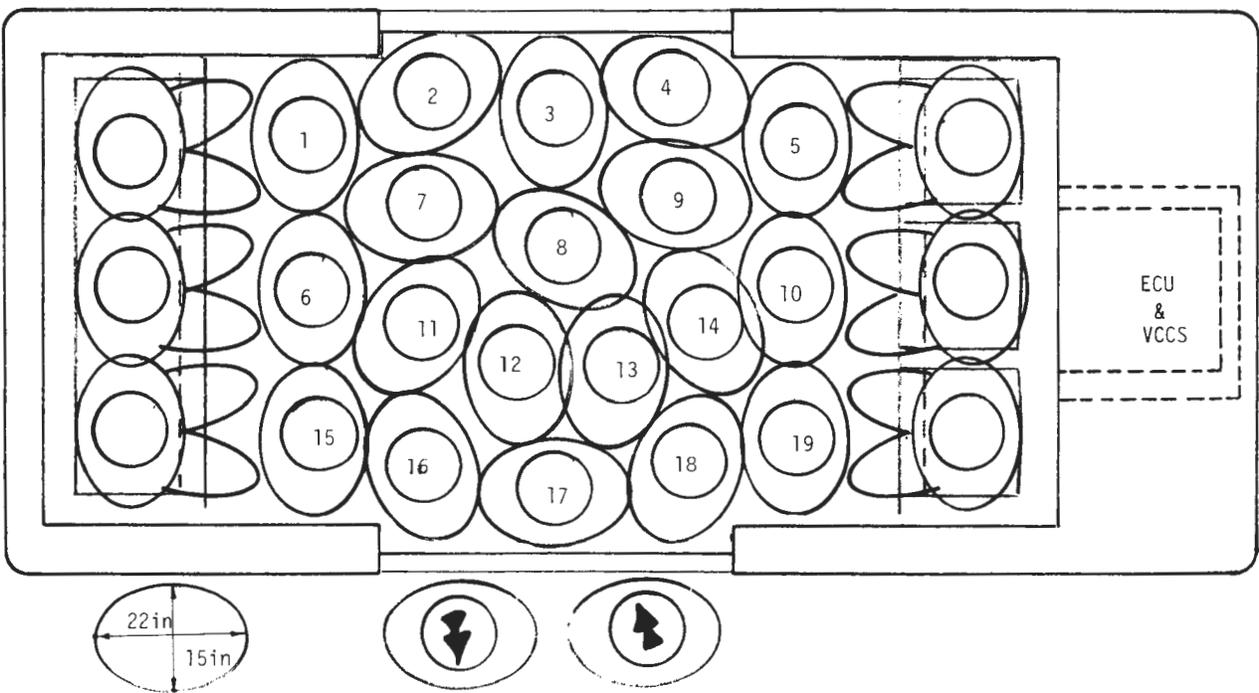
OCCUPANCY DIAGRAM FOR EXAMPLE REVISED FLOOR PLAN
